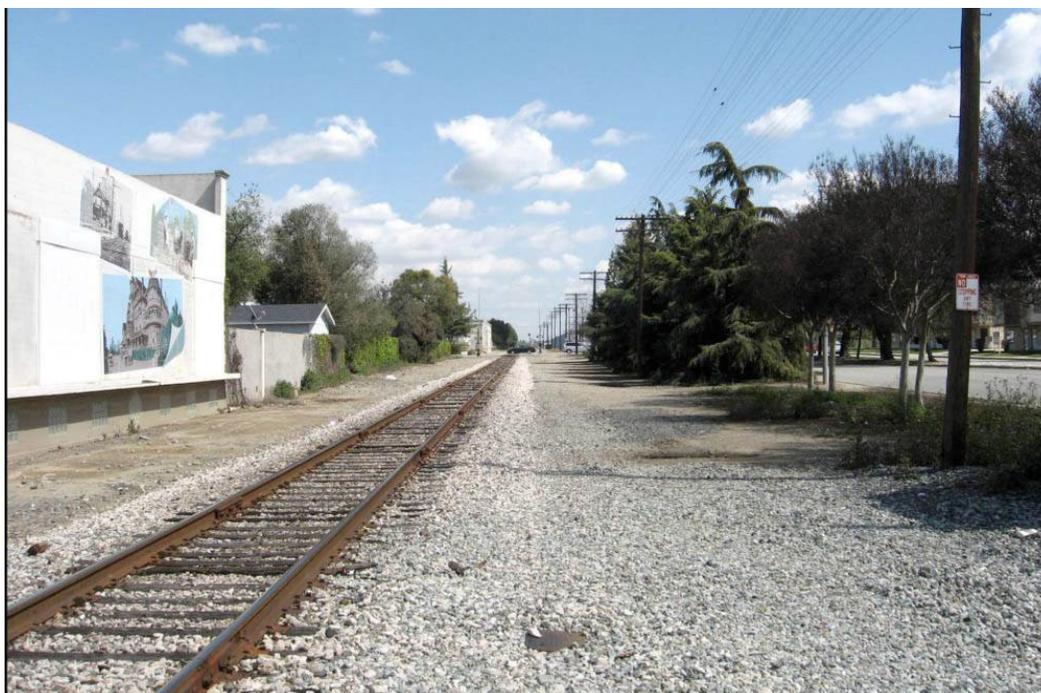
San Dimas –Walnut Avenue along Railroad Alignment
